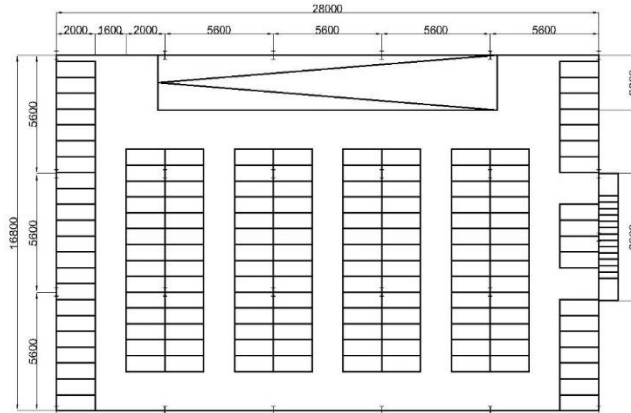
Desain Design Layout of Floors 2-6 at Location Plan A
